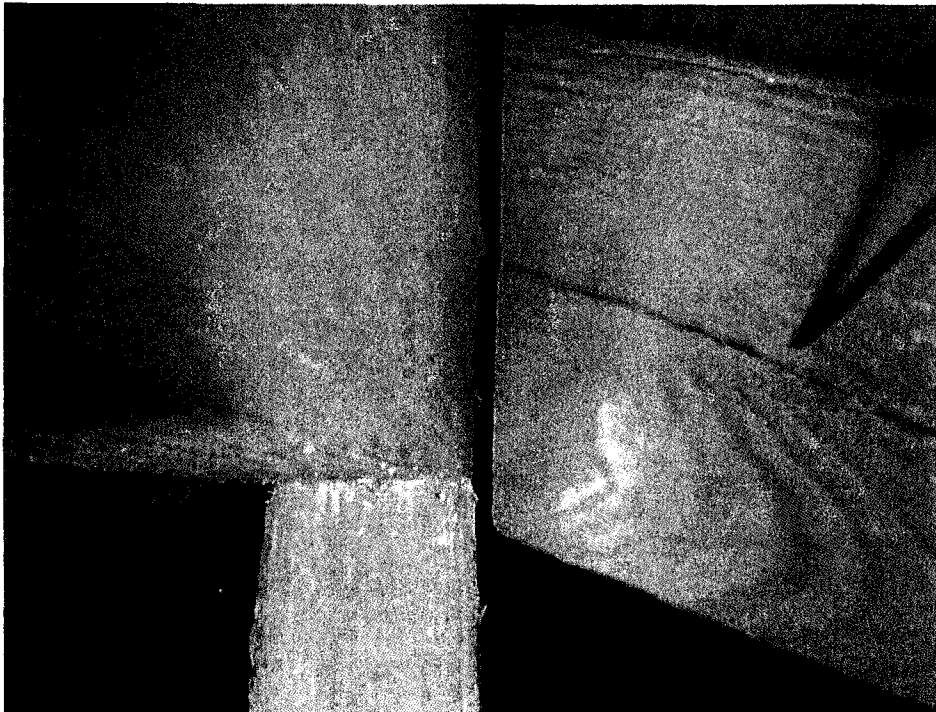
View of the separation along the ridge beam and rafter connection in which the exposed nail exhibited corrosion.
